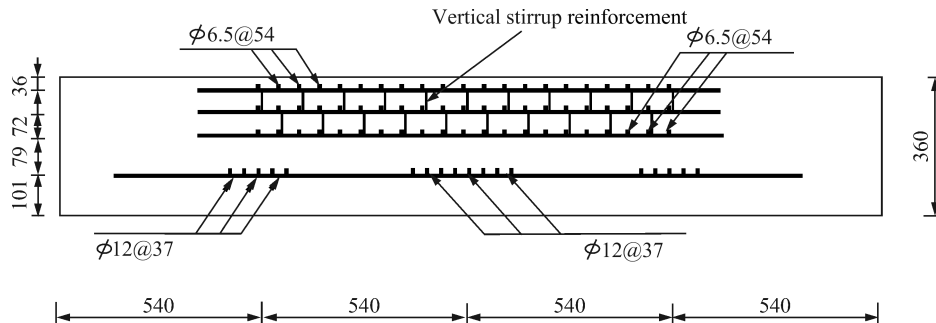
Four layers of steel mesh reinforcement of S3 (unit: mm)
